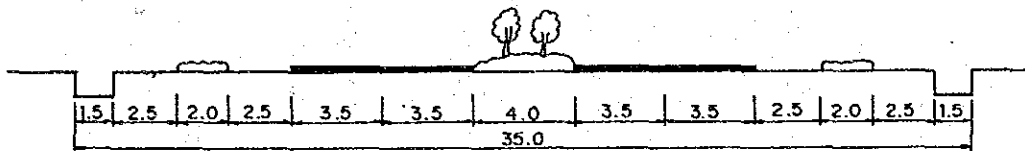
(h) Road and Bridge Sections (Unit; m)
